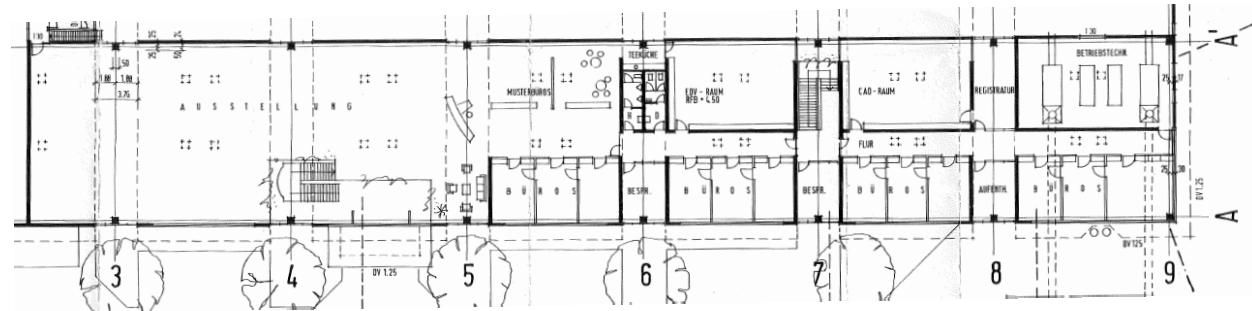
Layout Drawing of the Second Floor of the Office Section by Schöne + Seeburger
